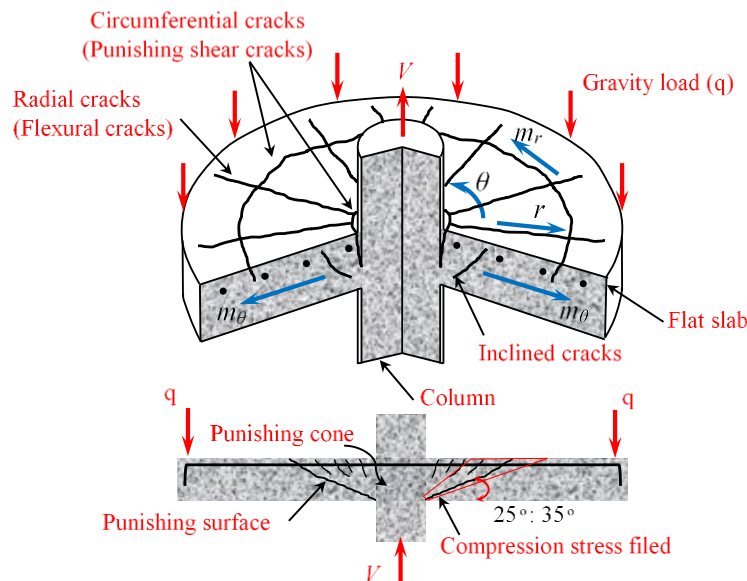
Typical cracks at interior slab-column connections.
